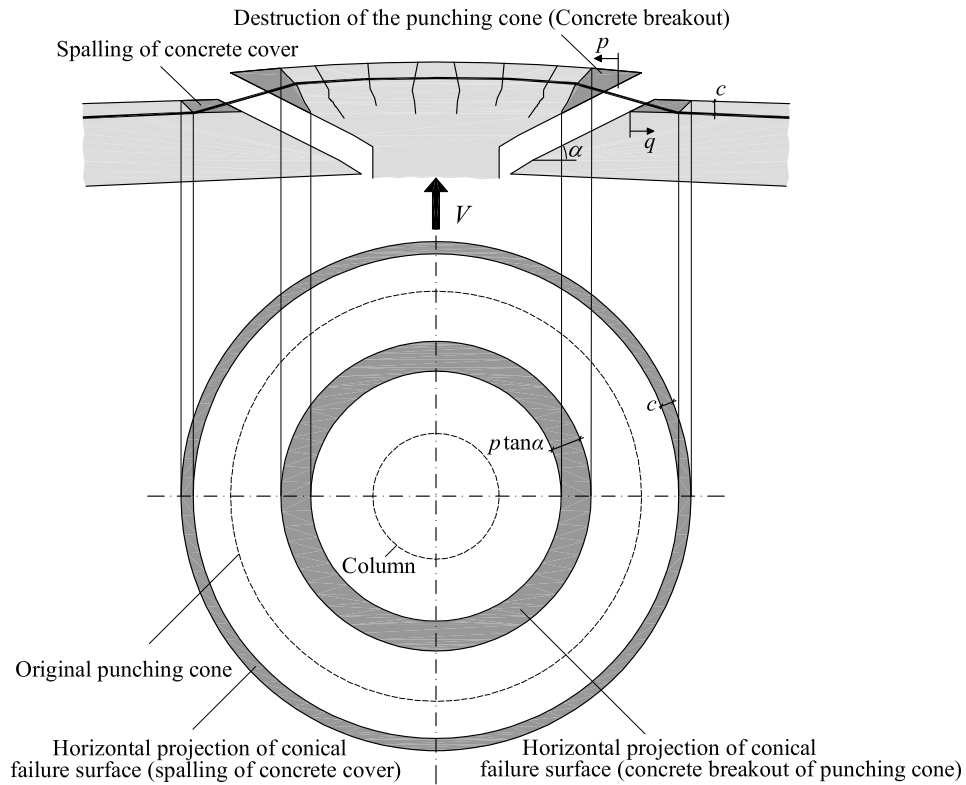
Projection area of the concrete breakout of punching cone and projection area of spalled concrete cover
